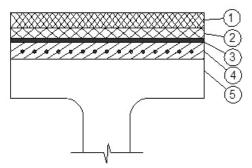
The proposed design of the roadway with the laying of an aluminum sheet on an additional layer of ordinary concrete (option 3): 1-top layer of asphalt concrete pavement; 2-lower layer of asphalt concrete pavement; 3- waterproofing (aluminum sheet); 4-ten-centimeter reinforced layer of ordinary concrete; 5-plate main beam
